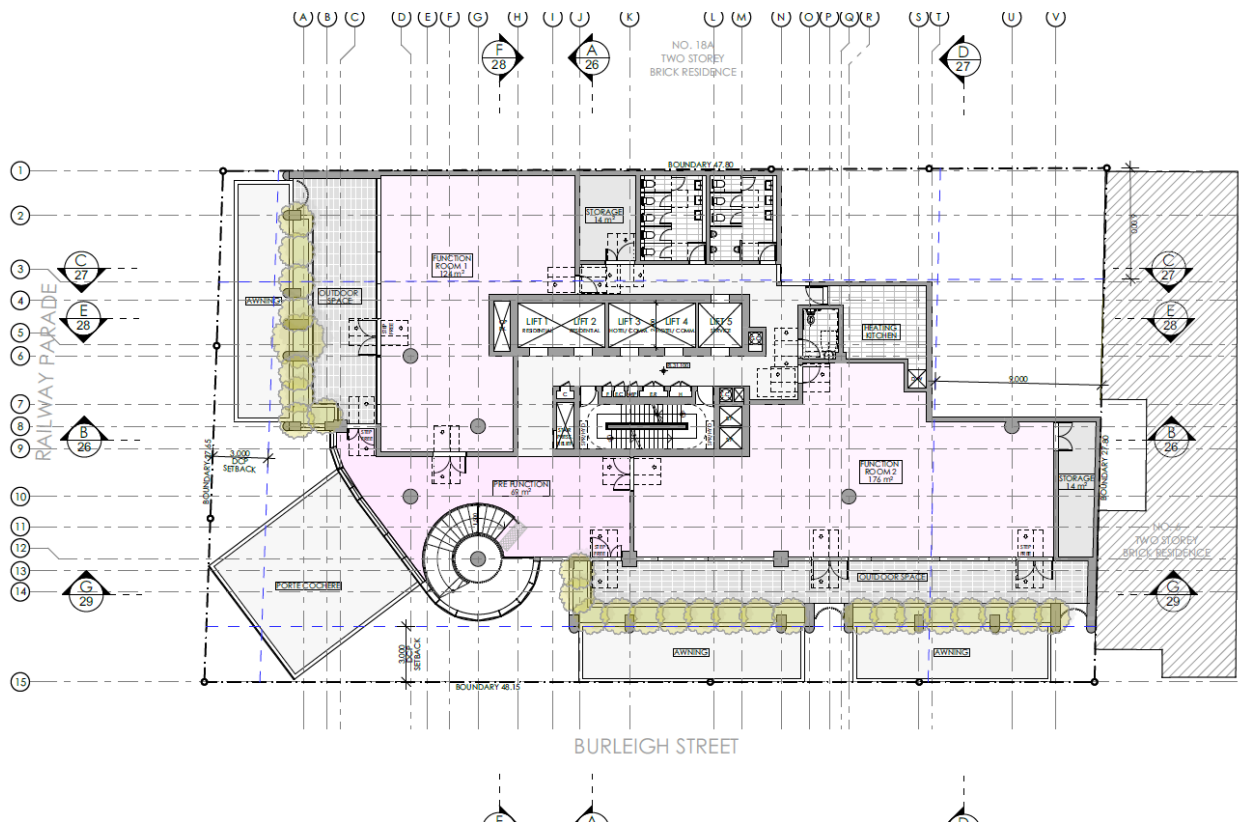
Level 1 Floor Plan prepared by PTI Architecture.
